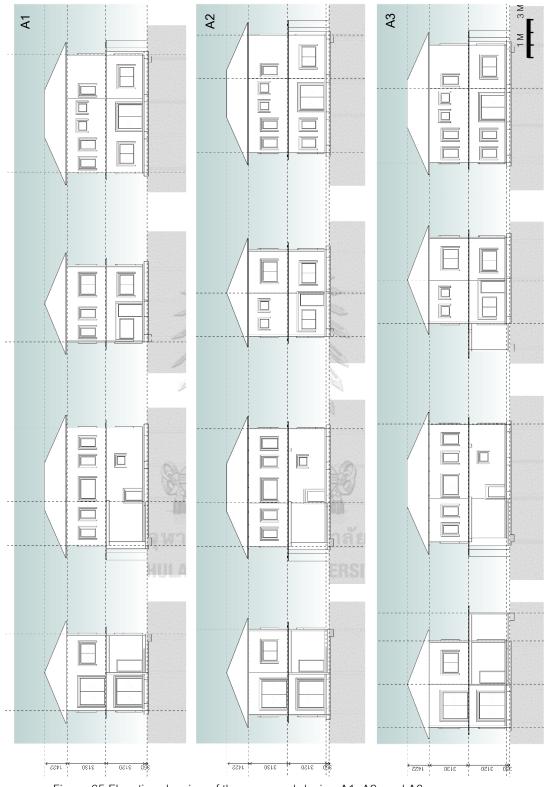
Elevation drawing of the proposed design A1, A2, and A3.
